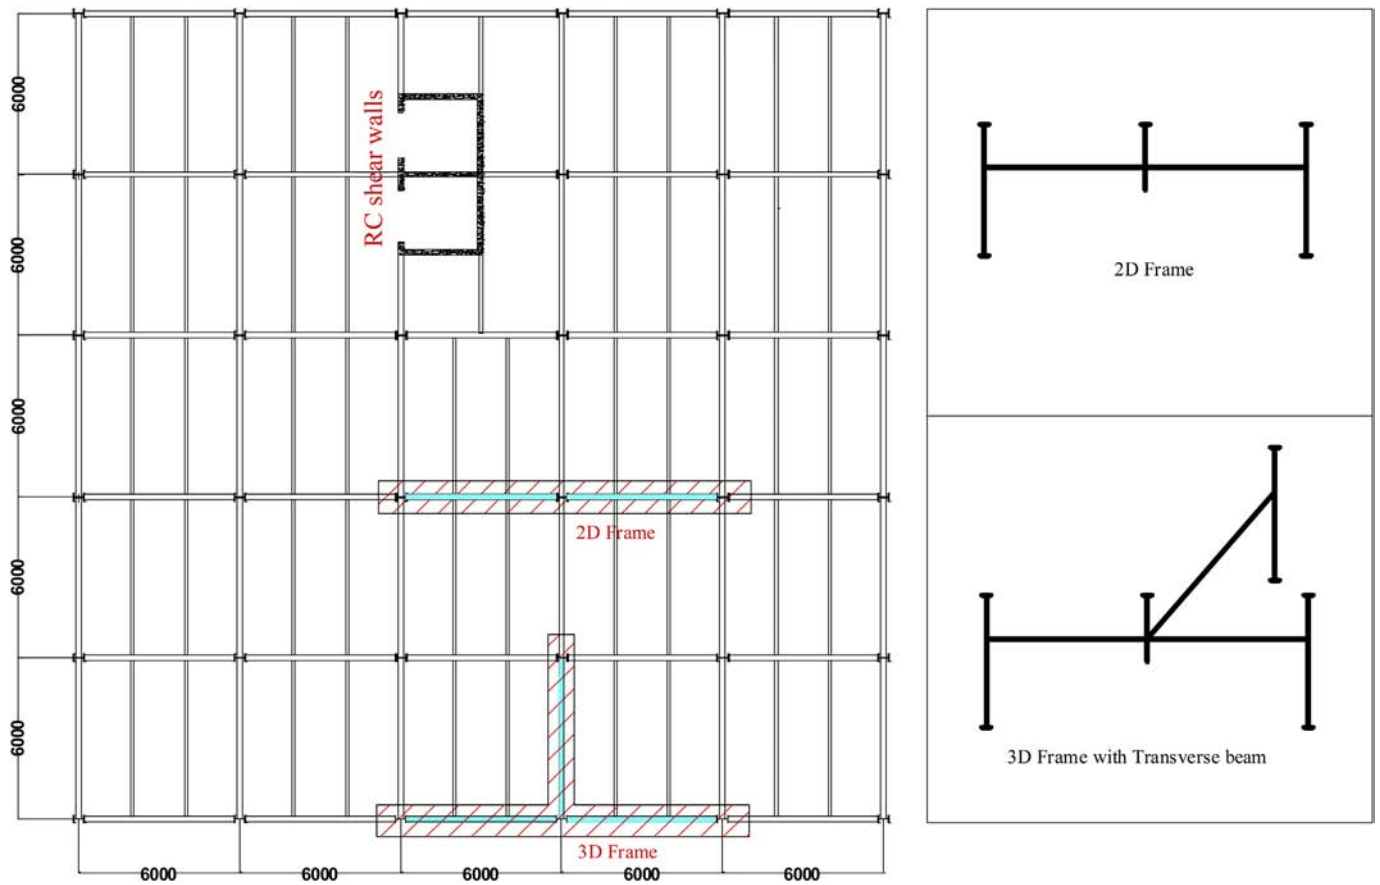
Plan view of prototype building and selected specimens (Dimensions are measured in mm).
